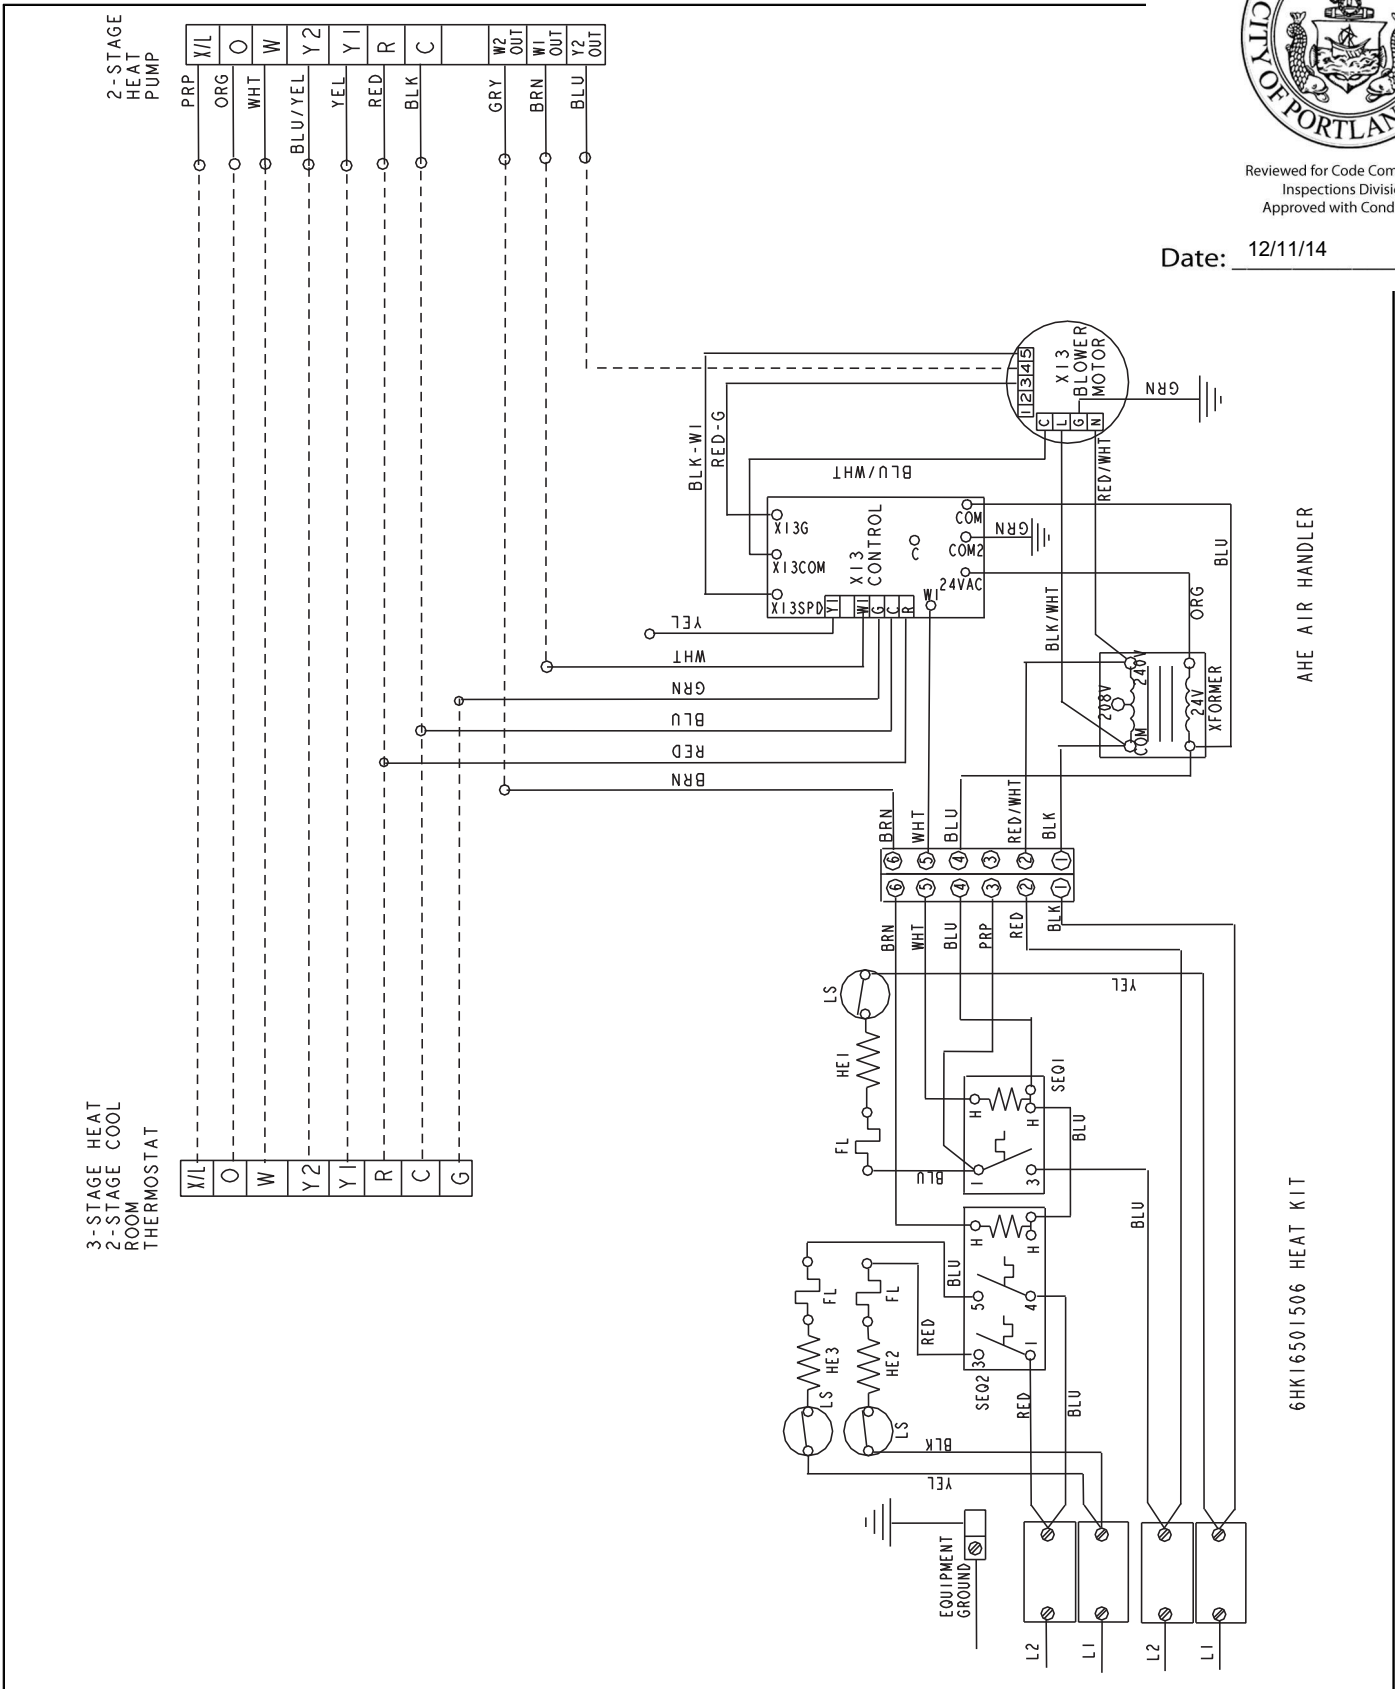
Typical Thermostat Wiring for 2-Stage Heat Pump with ECM Blower Motor - ECM
